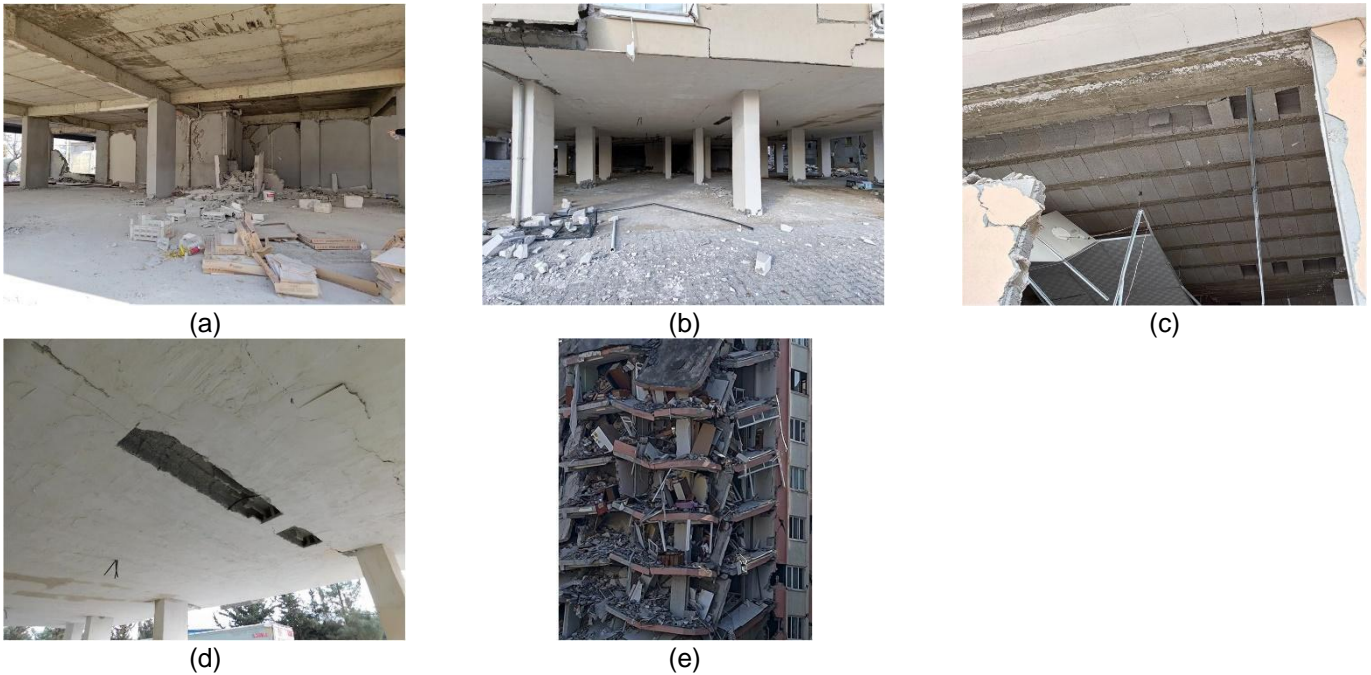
A floor slab system (a) supported by beams and columns, (b) directly supported by columns, (c) and (d) bricks of the no-beam slab system fallen down, (e) a building with the no-beam slab system was under demolition.
